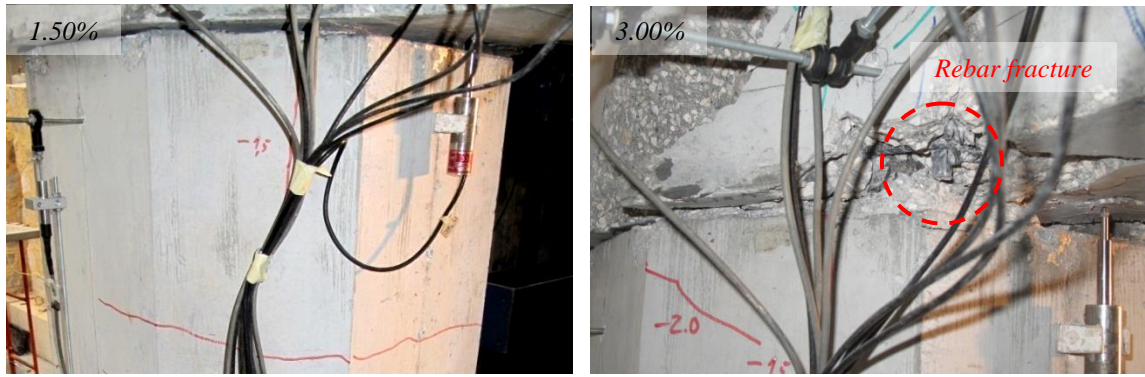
SP_PC02B: Progression of north precast joint opening
